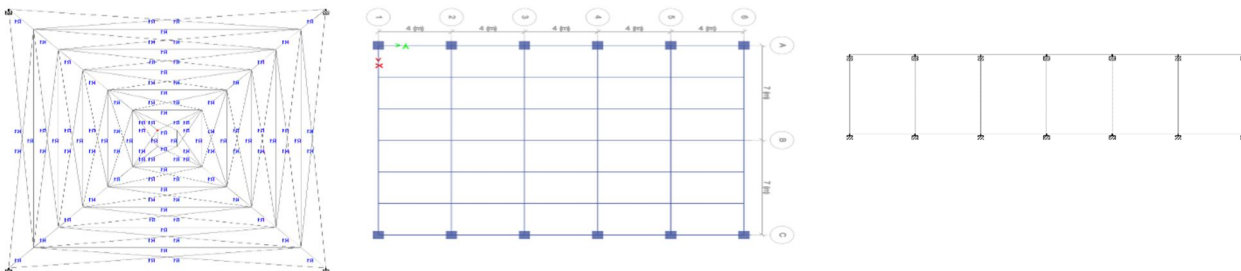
(a) Plan of Tower, (b) Plan of Truss & (c) Plan of Howe Truss
